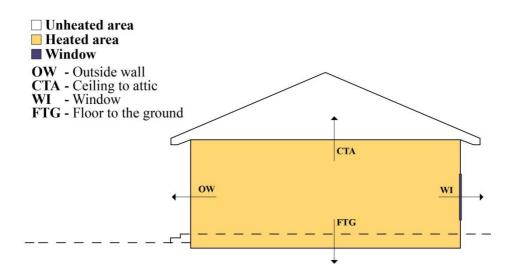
Building elements shown by location in the brick building and in the virtual straw-bale building
